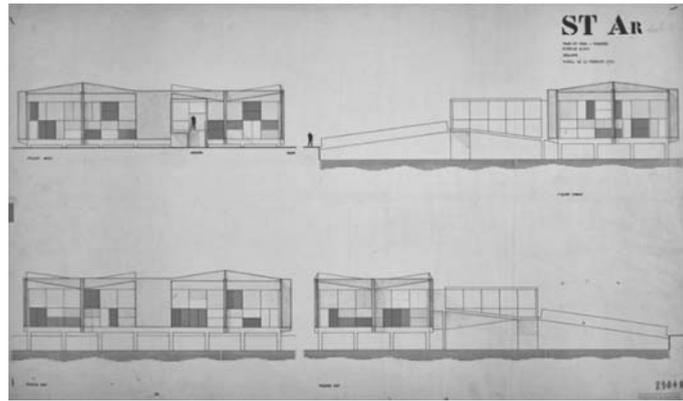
Pavillon Exhibition, Palais Ahrenberg, FLC 25048 (FLC/ ADAGP).
